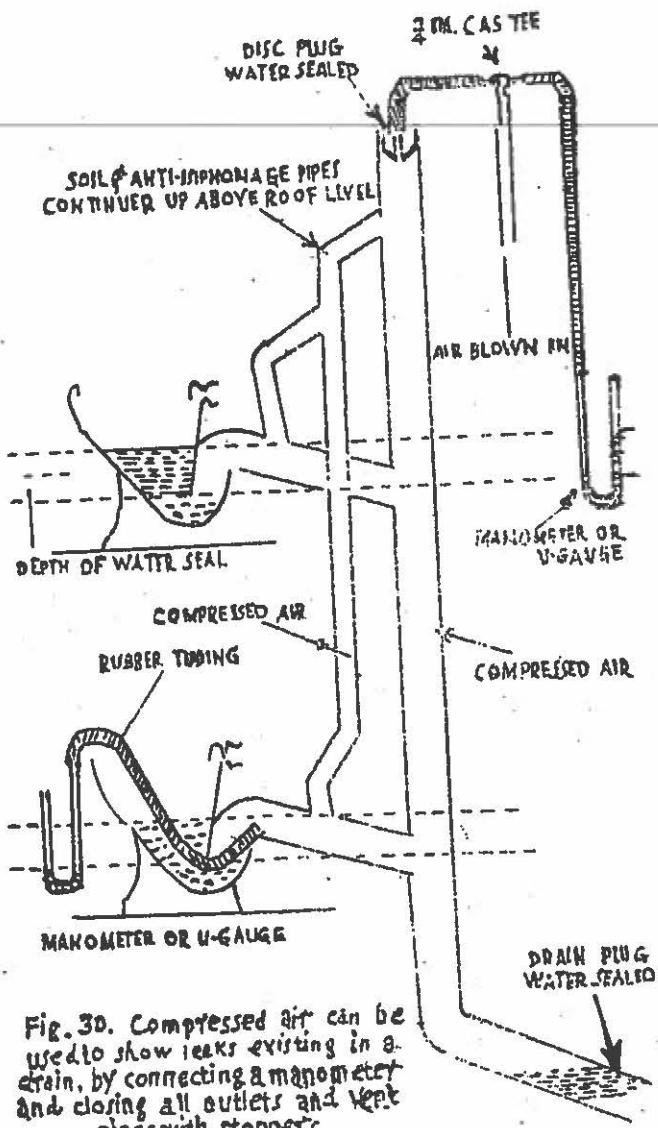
Compressed air can be used to show leaks existing in a drain, by connecting a manometer and closing all outlets and vent pipes with stoppers.
